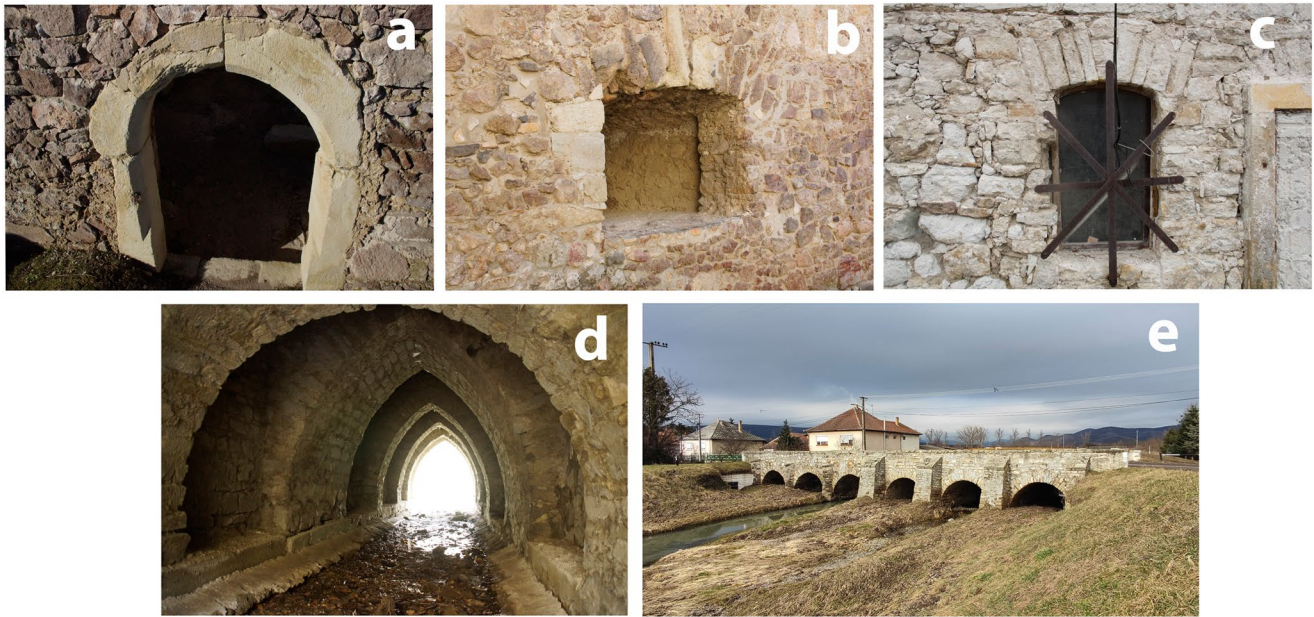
Use of volcanic tuff as a building stone. (a) Original, medieval door frame, Sátoraljaújhely fortress (Vágáshuta Tuff, the wall rock (pink) is dacite). (b) Fortified wall, Sárospatak castle (various stones).
